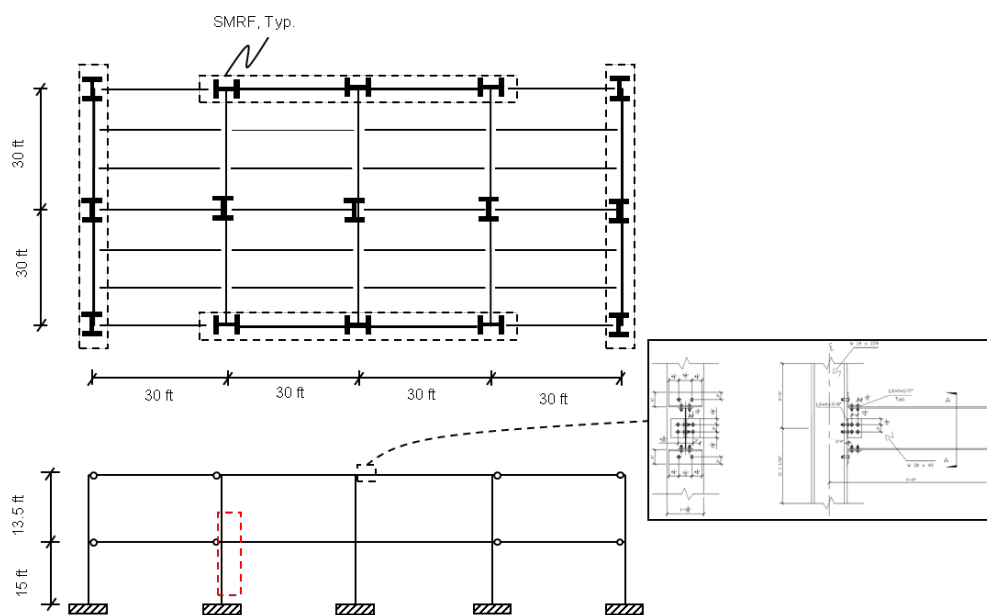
Plan view of the structure, an elevation of the SMRF and a zoom-in of a typical connection topology
